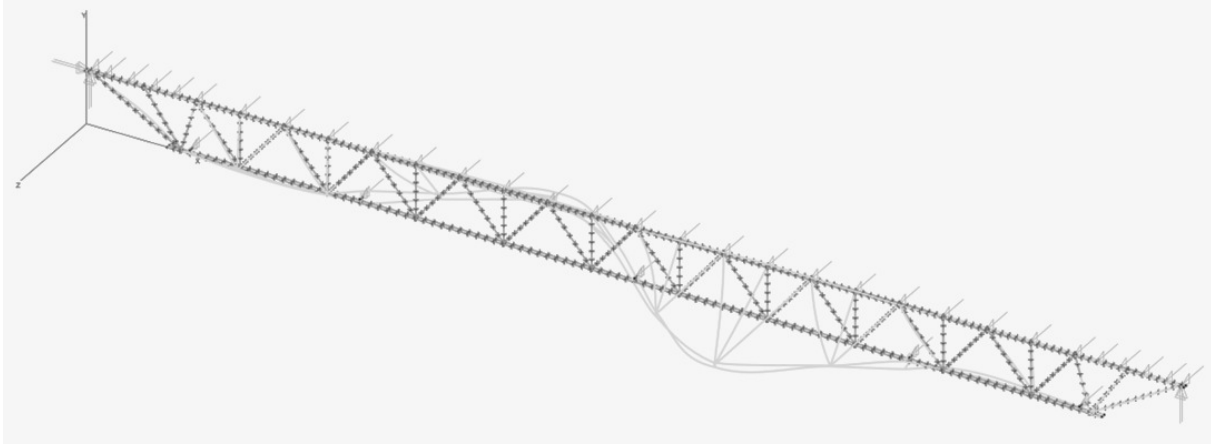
First mode buckling of joist with 150-inch bottom chord bridging spacing
